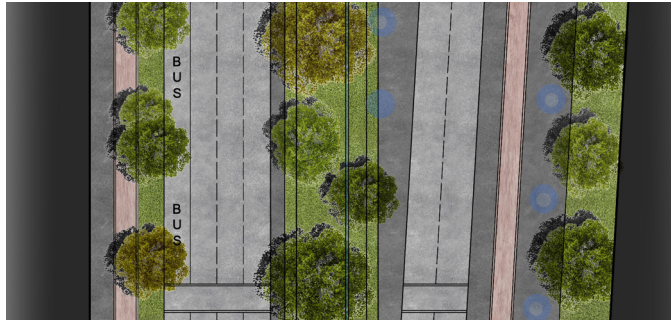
Plan of Heat Prevention measures on Schiffgraben, Area B (Masterplan) (own depiction)
